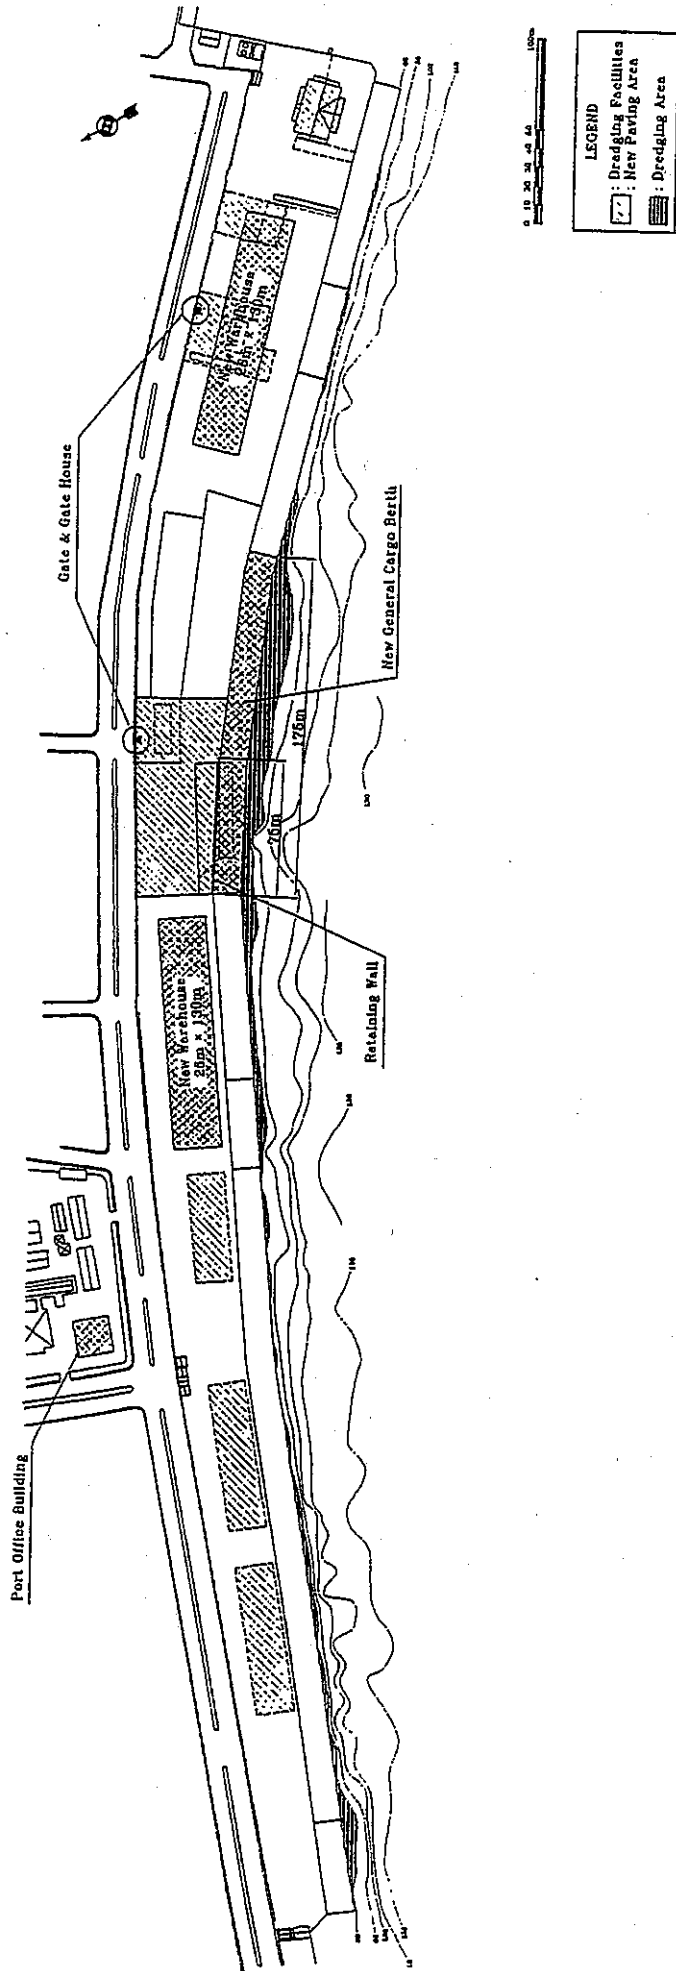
Layout Plan of Existing Samarinda Port (2025)
